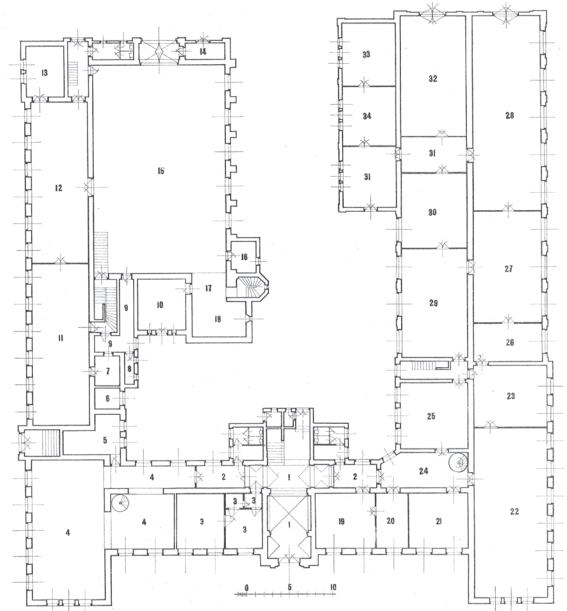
The first floor plan of the Applied and Agricultural Mechanics Laboratory. (After [6, p. 466] [12, p. 31] [18]) 1. Hall. 2. Passage. 3. Servant's quarters. 4. Laboratory. 5. Small room. 6. Spare room. 7. Dark room. 8. Storage of benzine. 9. Store-room. 10. Coal-cellar. 11. Collections. 12. Mechanical workshops. 13. Tool store. 14. Generation of gas. 15. Room for testing machinery. 16. Lavatory. 17. Passage. 18. Tower. 19. Office. 20. Assistant's room. 21. Adjunct's room. 22. Laboratory for students use. 23. Pounding room. 24. Cloak room. 25. Polishing room. 26. Refrigerating room. 27. Mechanical workshop. 28. Werder machines. 29. Cement laboratory. 30. Damp room. 31. Store room. 32. Concrete store. 33. Furnace. 34. Steam room.
